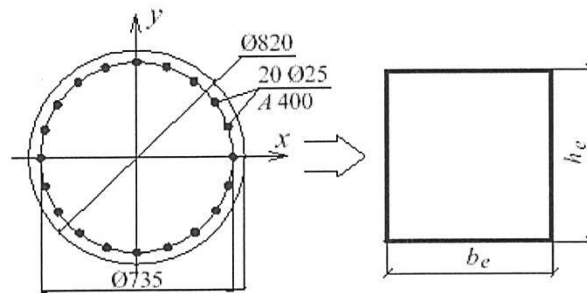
Scheme of bringing the real pile cross-section to equivalent one. Accept $h_e=b_e$.
